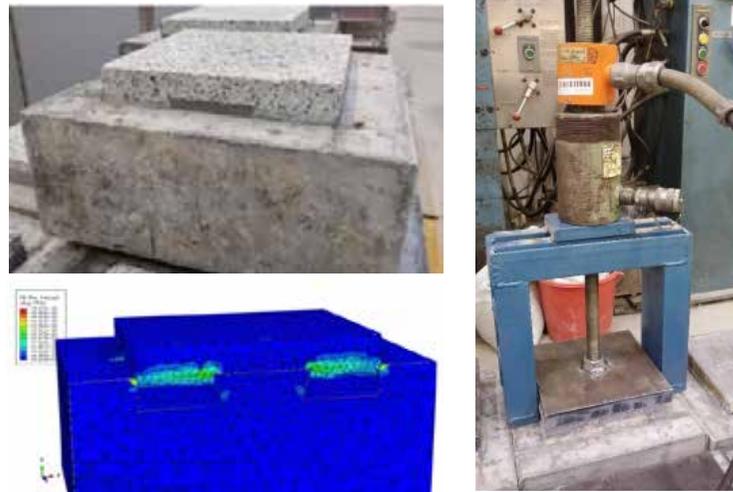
Anchorage capacity of the new stone façade system: laboratory tests and finite element analysis
